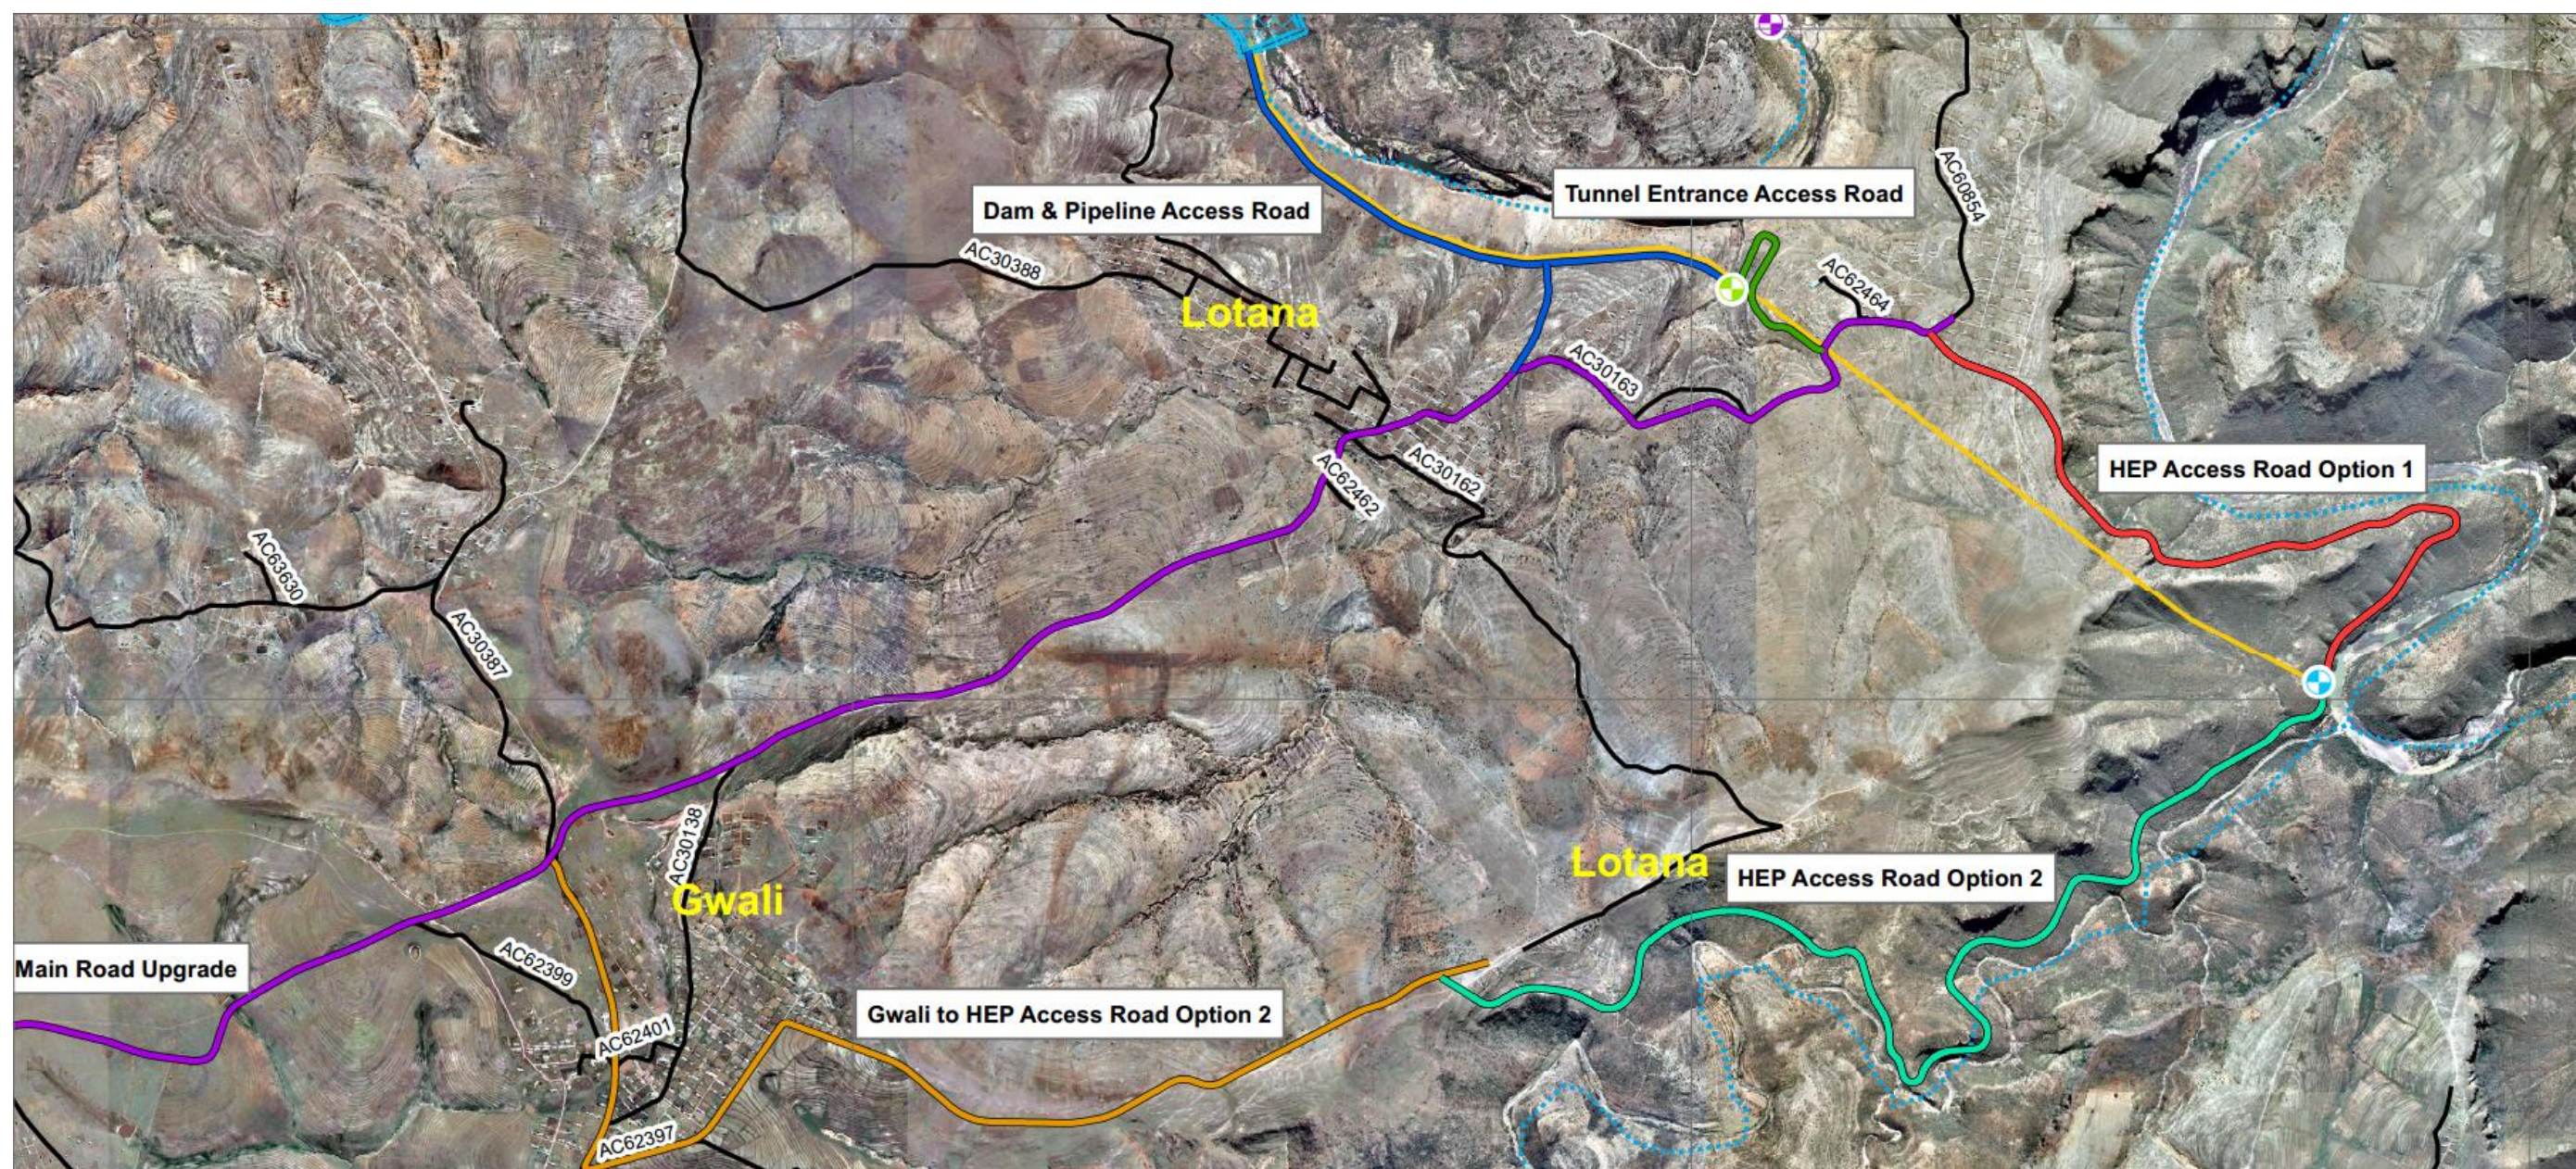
Main Access Road and Other Roads to Construction Sites
